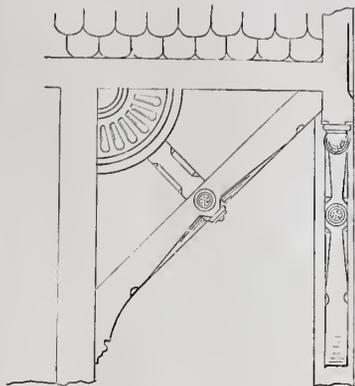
Detail of Finish Over Balconies on Bay Window.—Scale, 3/8 Inch to the Foot.
